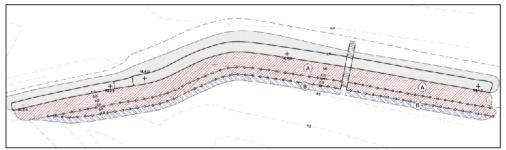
Layout plan of proposed vegetation and wind fences
